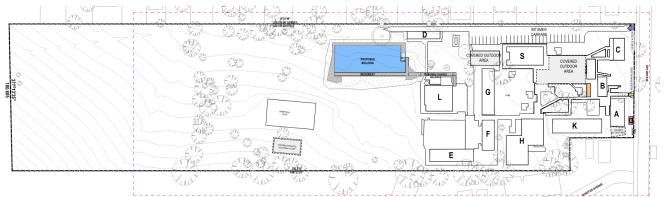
SITE LOCATION, WITH PROPOSED BUILDING SHOWN IN BLUE
